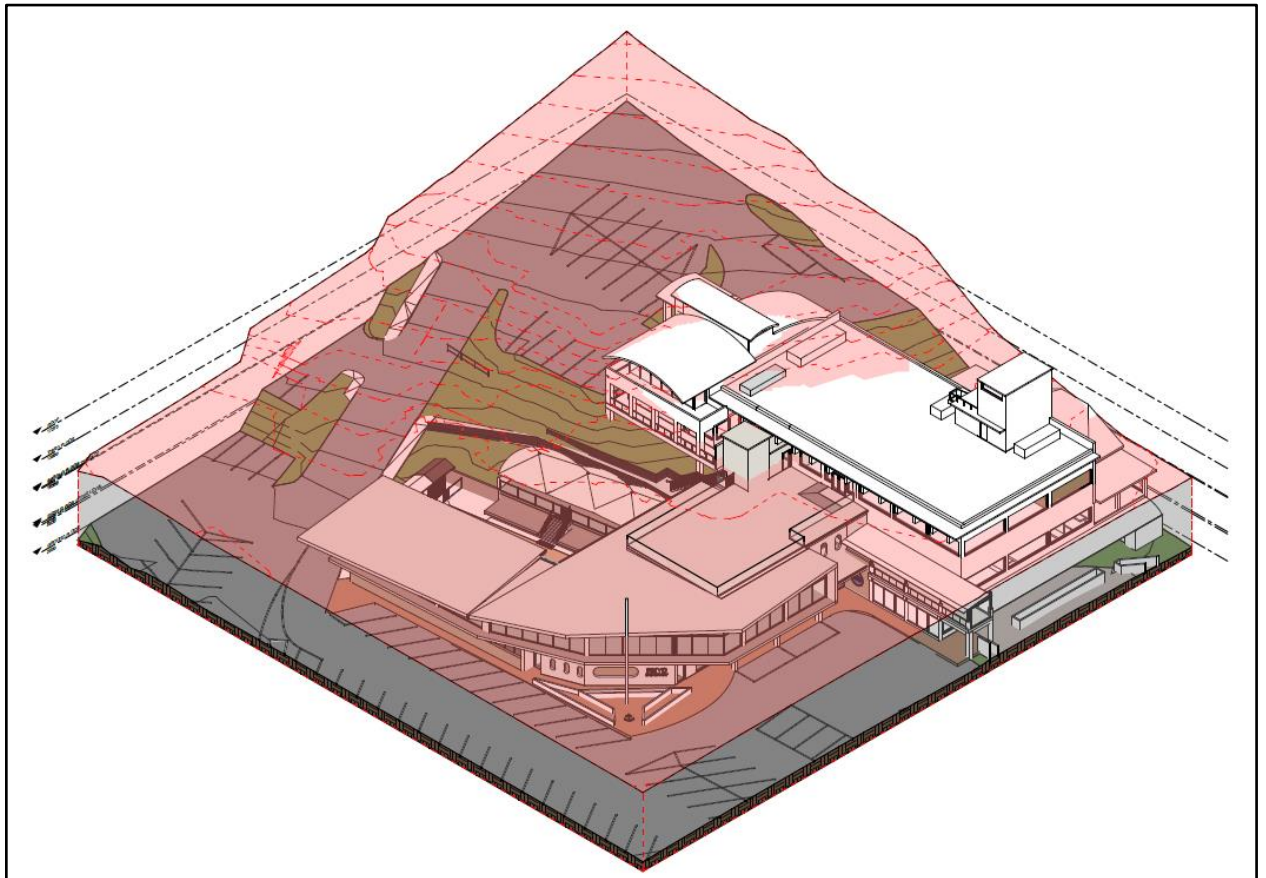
Three dimensional diagram of the proposal indicating areas of landscaping throughout the site which are to be retained (shaded green).
